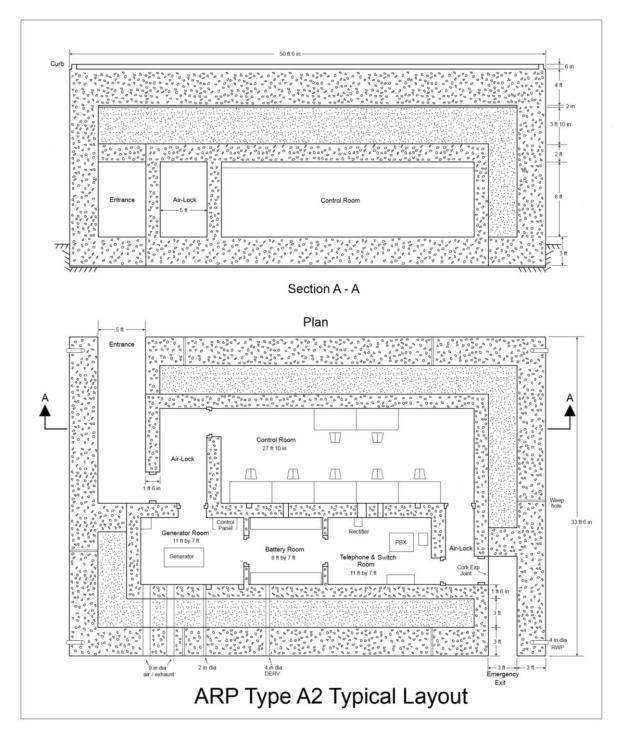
Plan and section of LMS ARP type A2 District Control Room (generic design)
